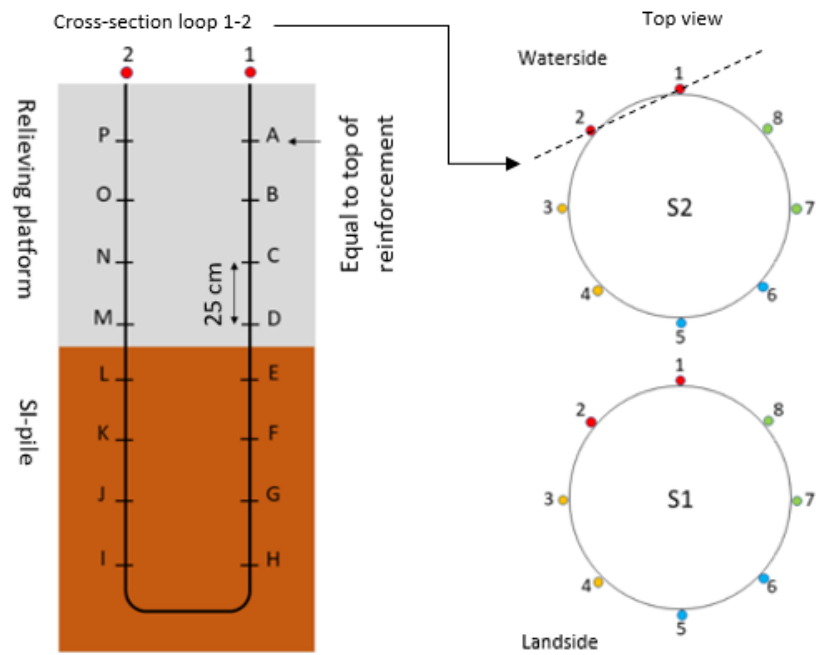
cross-section and top view of bearing piles with FBG sensors
